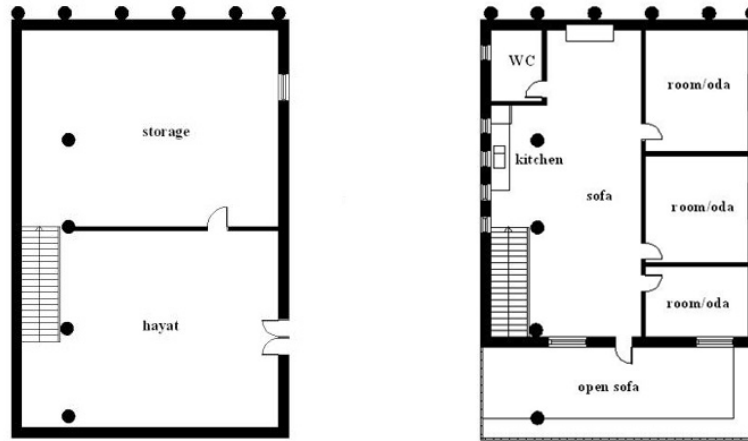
Ground and first floor plans of Mehmet Topal House. (Drawings by Author, 2011)
